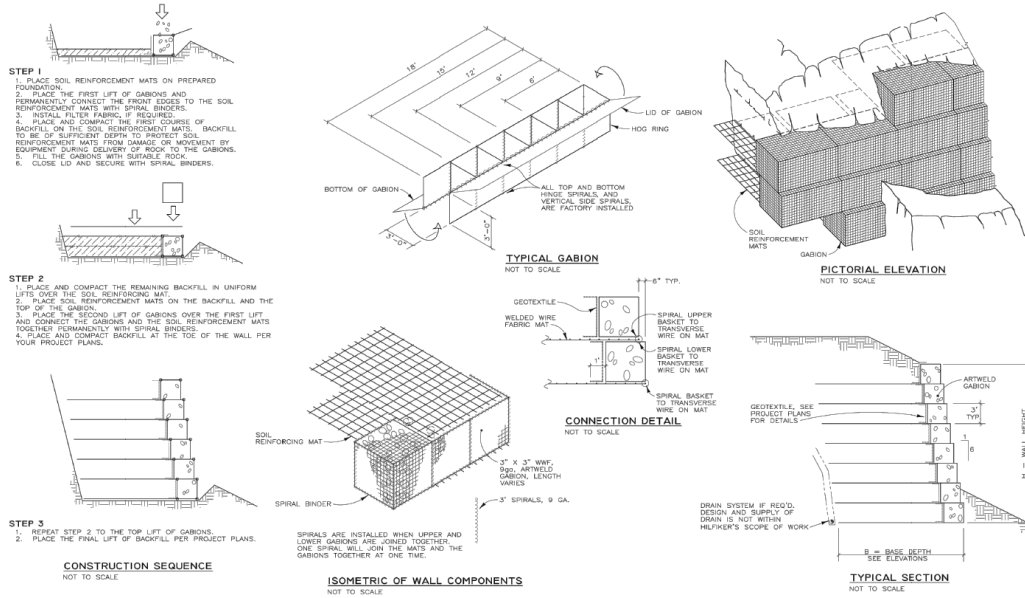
Standard Gabion/Reinforcement Details from Hilfiker
